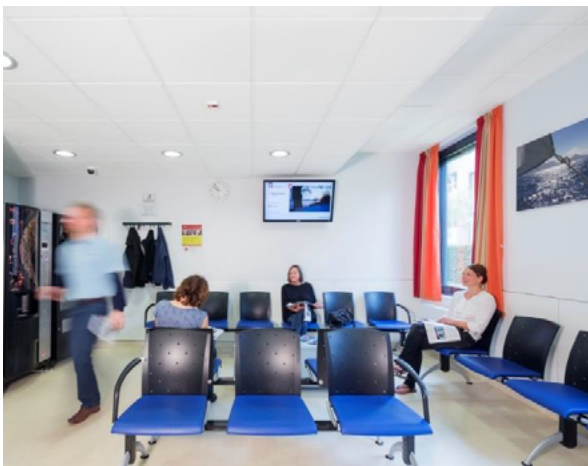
Additional sound absorbing ceiling hanging in waiting area (Left)
